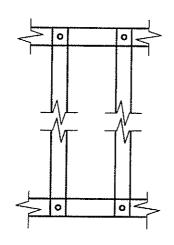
Exterior Connection: Infill Picket Nailed to Rail
